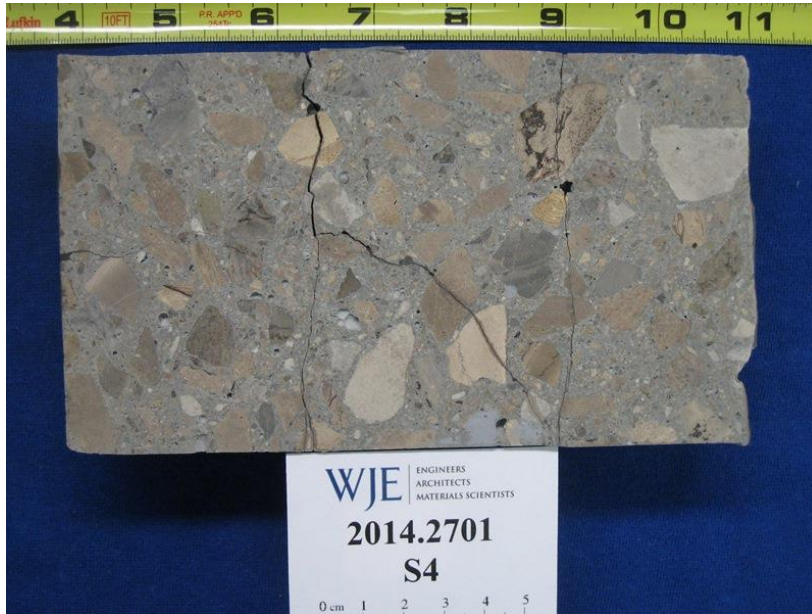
Core S4. Lapped cross section illustrating the appearance of the concrete. In-service top end is on left.
